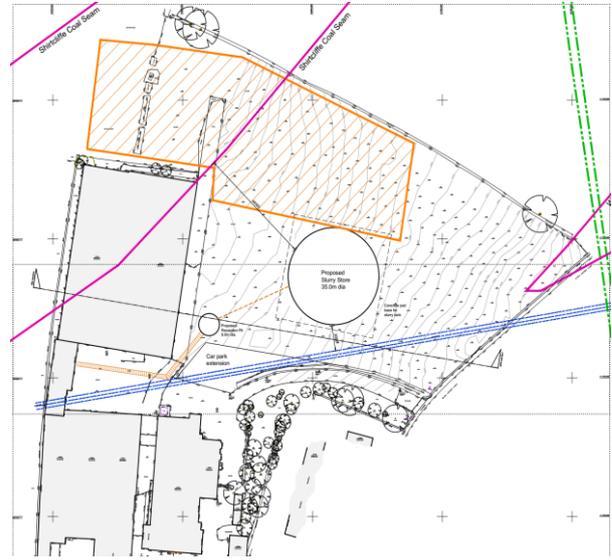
Development as Proposed - Land at Bark House Dairy Farm, Huddersfield Road, Shelley, HD8 8LJ.
